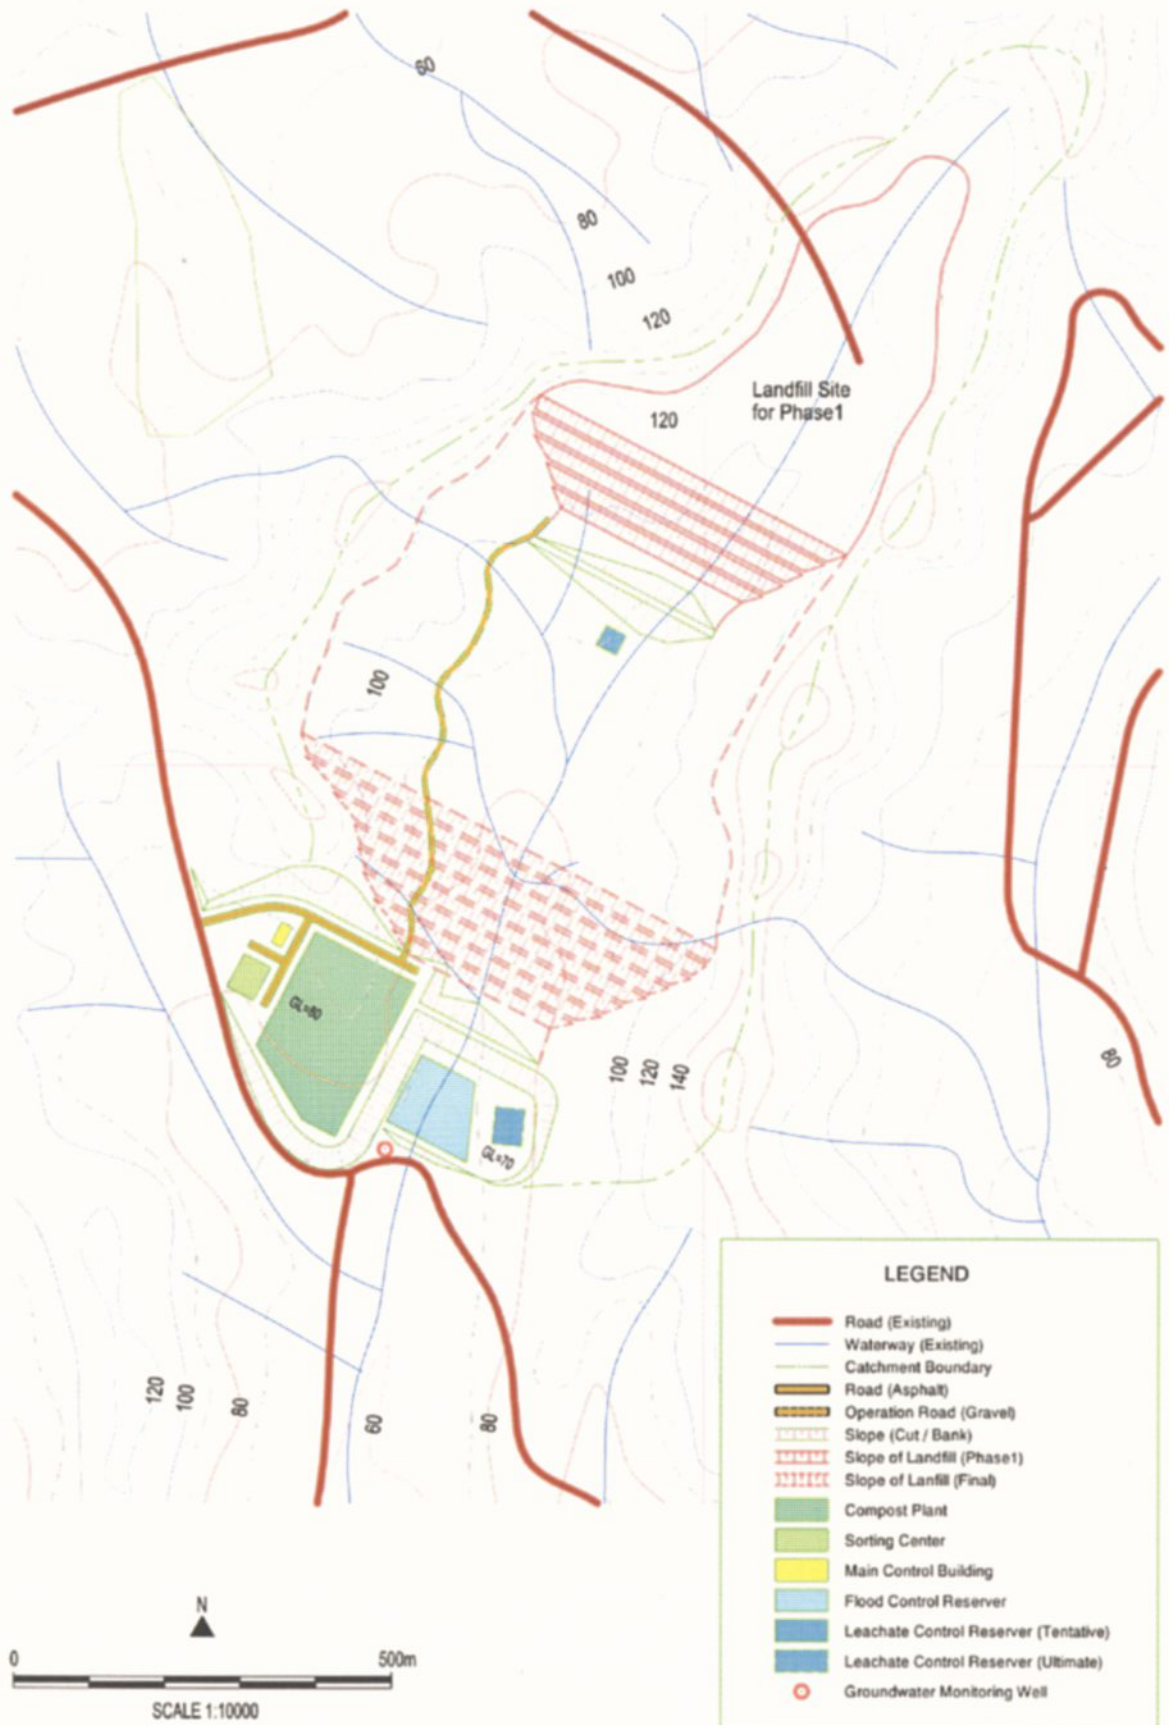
Layout Plan of Qasia Inter-municipal Disposal Site
